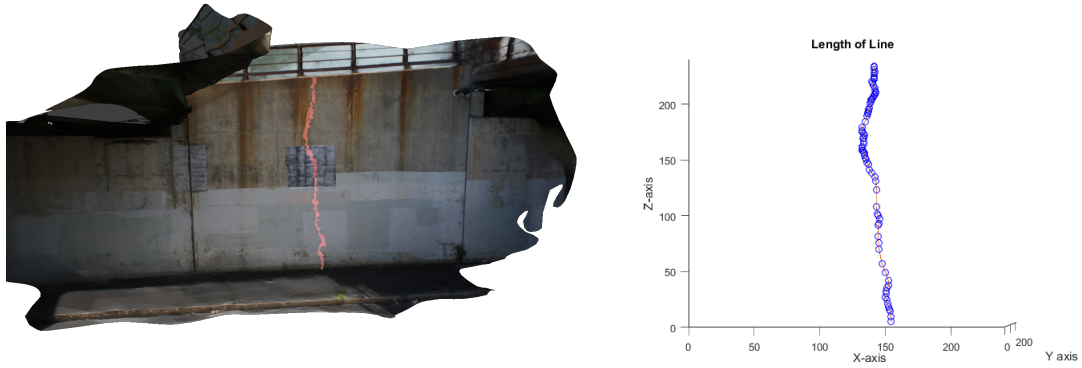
Surface crack profiling at Lincoln Street bridge, Lowell MA.
